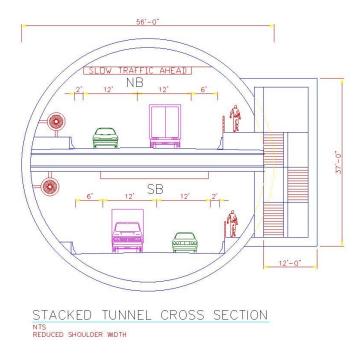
Stacked Tunnel Cross Section with Reduced Shoulders
